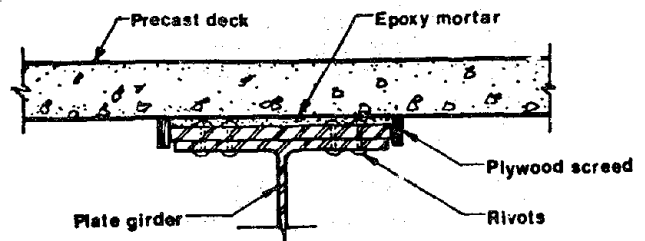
Connection detail, Santa Fee Railroad bridges.
